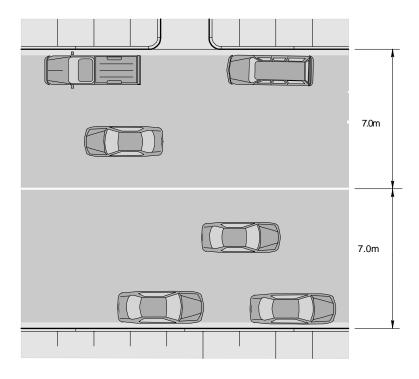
Kerr Street, existing Lane Configuration, E 49th Ave. to E 63rd Ave. (typical)
